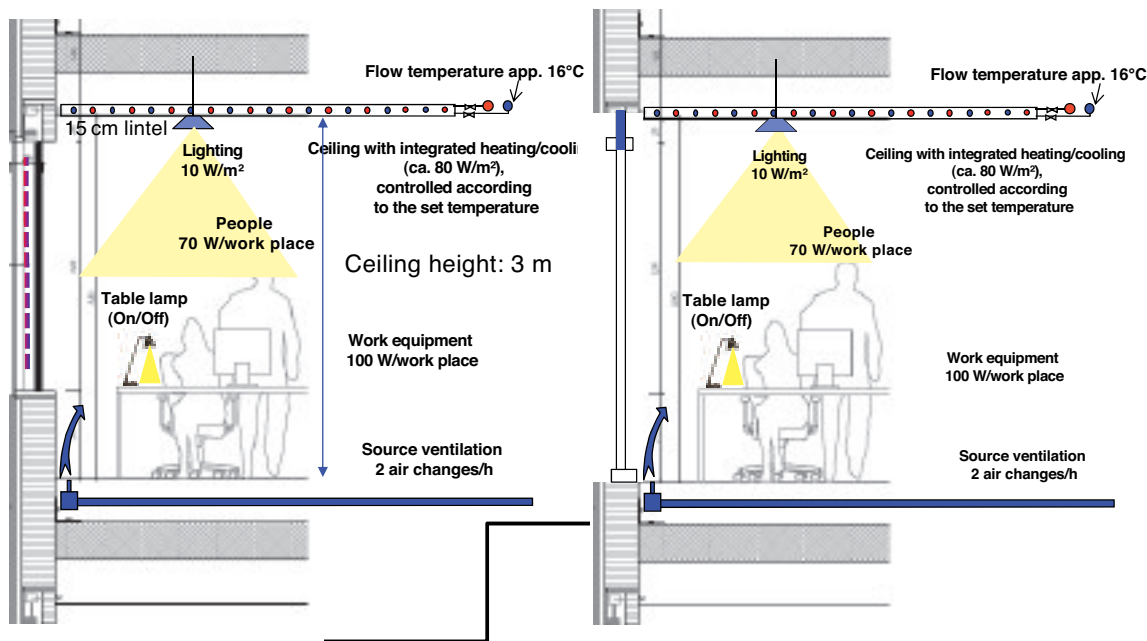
(left): Cross section of an office room with a parapet (natural stone façade)
